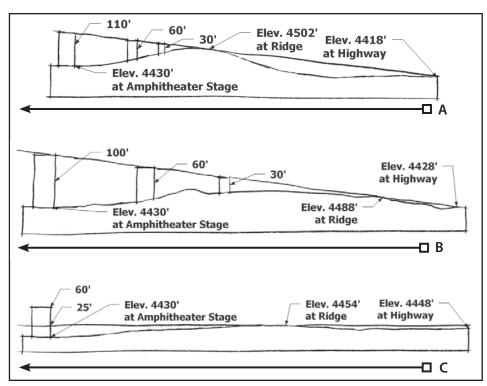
Elevation Cross sections from 3 viewpoints on 89A.
